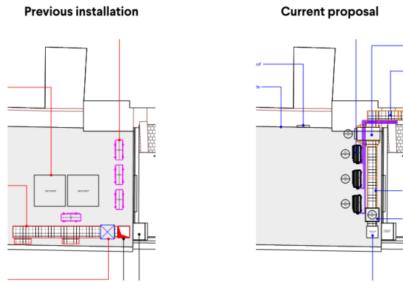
(above): Roof plan of the existing (now removed) plant (left) and proposed replacement plant (right)
